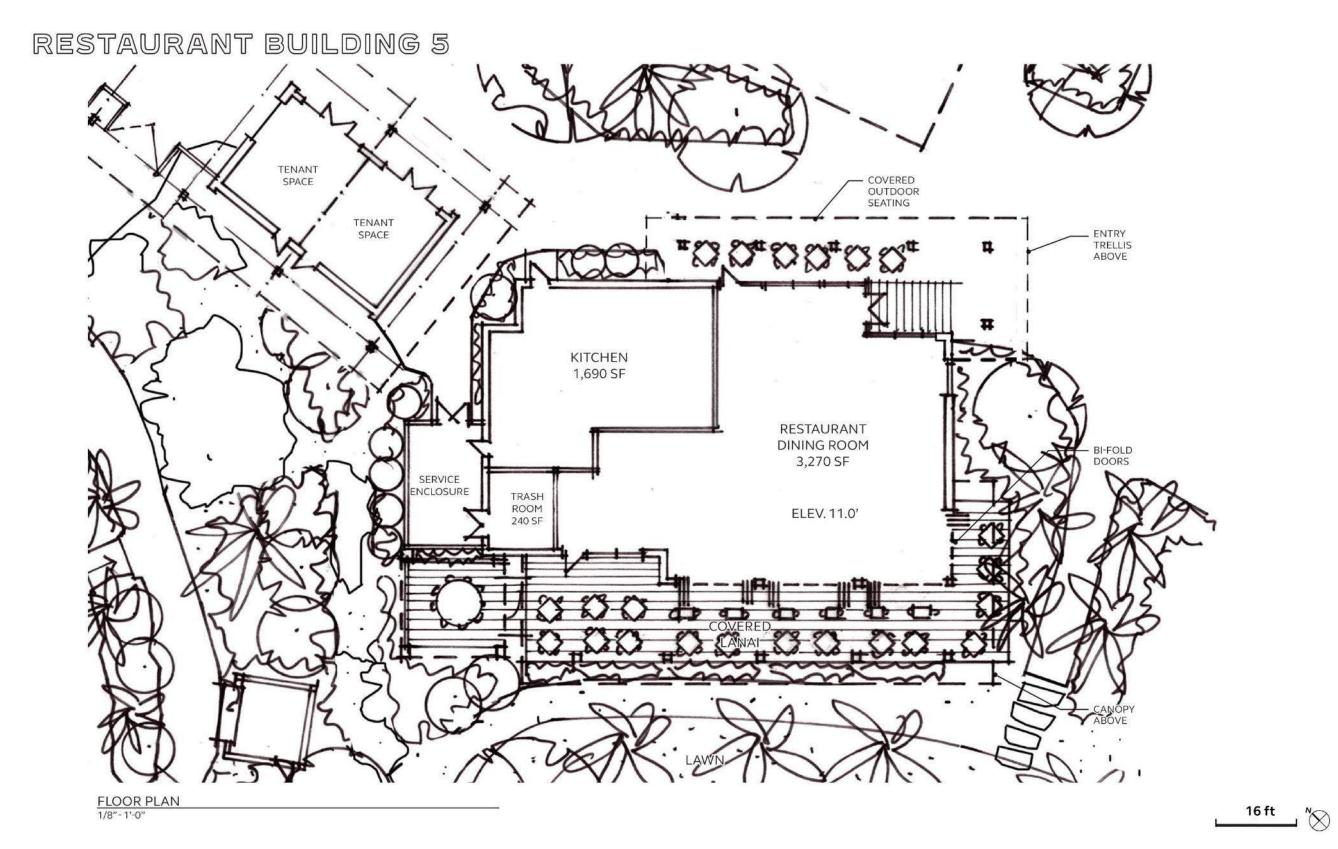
Restaurant Building 5 – Preliminary Plan
